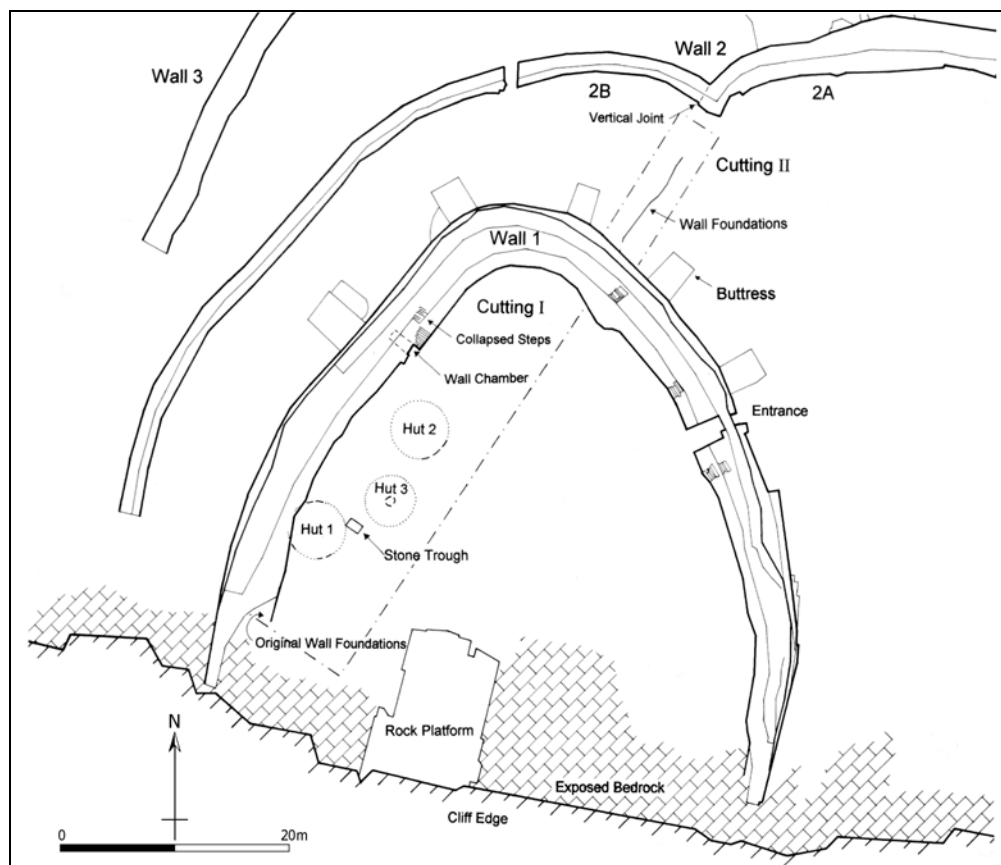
Site plan of the drystone structure at Dún Aonghasa, Co. Galway (Source Cotter 1993)
